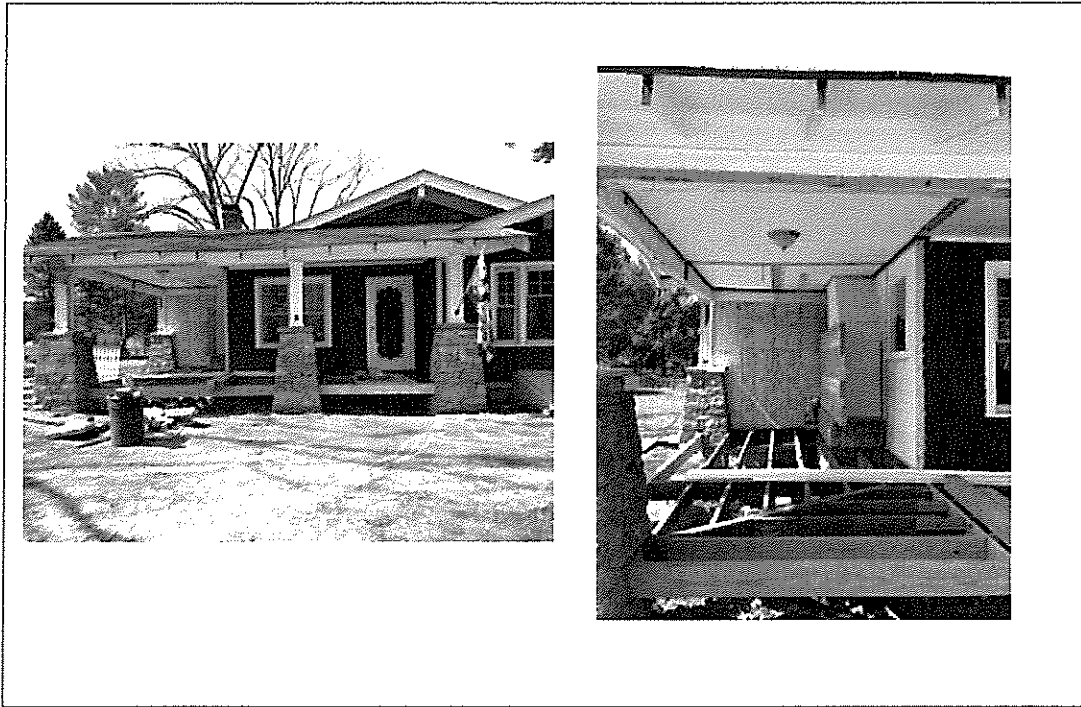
brick siding to be replaced with cedar shake, room 2 is the sun room, room 3 is the closed in porch. All brick to be removed.
